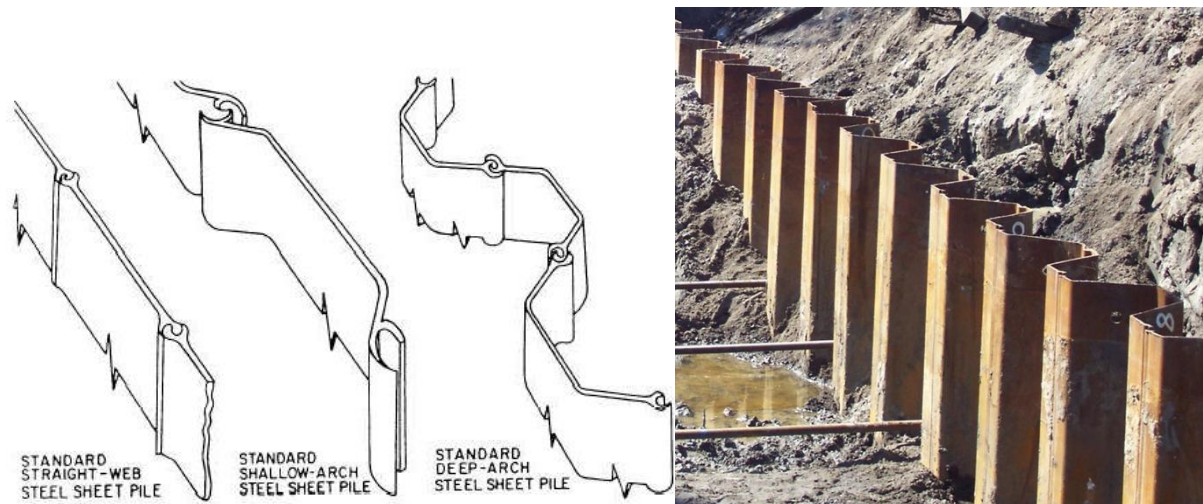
Types of sheet piling and an example of sheet piling. (www.tpub.com)
